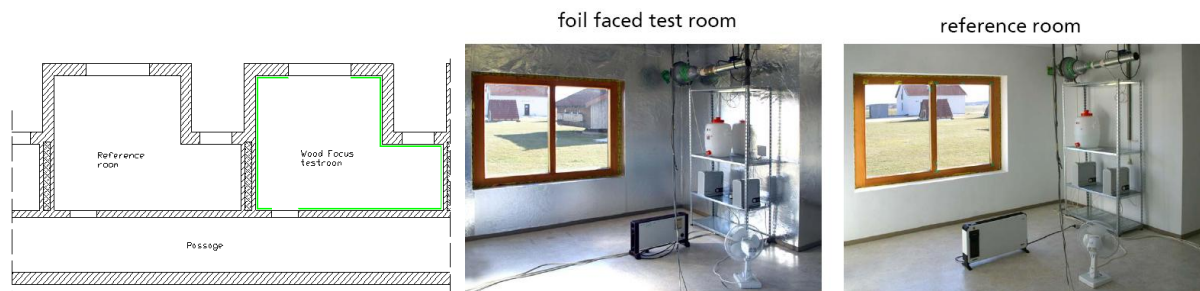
Experimental rooms used at the Fraunhofer Institut für Bauphysik, Germany, to generate field data for CE3. "Reference room": The surfaces of the walls and the ceiling are coated with common gypsum plaster and paint. "Test room": Surfaces of the walls and the ceiling are completely coated with aluminium foil.
